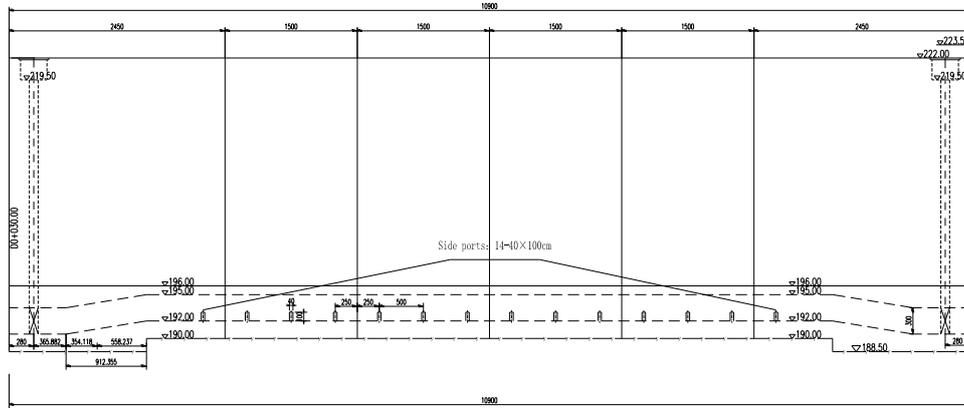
Layout of the upper lock head (Unit: Elevation m, Length cm)
